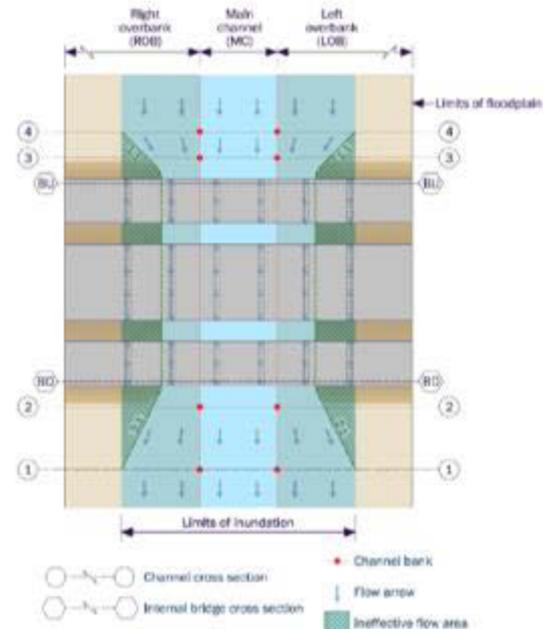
Parallel Bridges on Shared Embankment: Idealized Cross Section Layout
